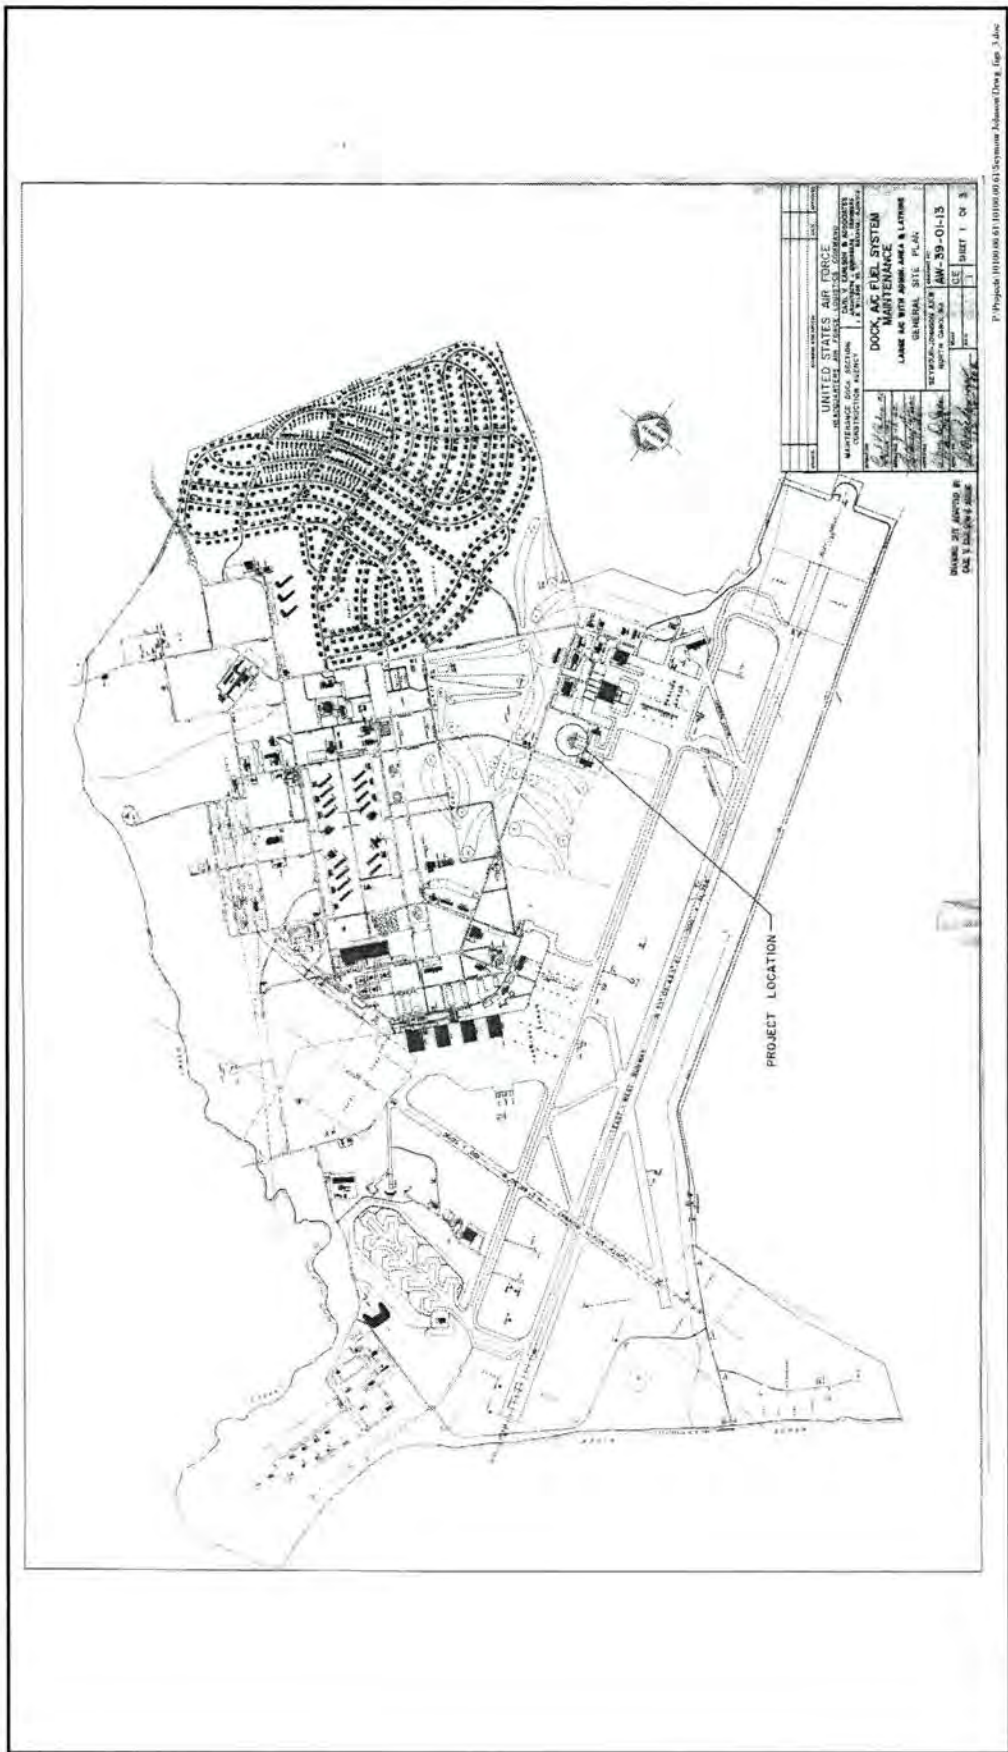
Building 4828—record drawing, general site plan, 1961 (Source: Seymour Johnson Air Force Base Civil Engineering Vault).
